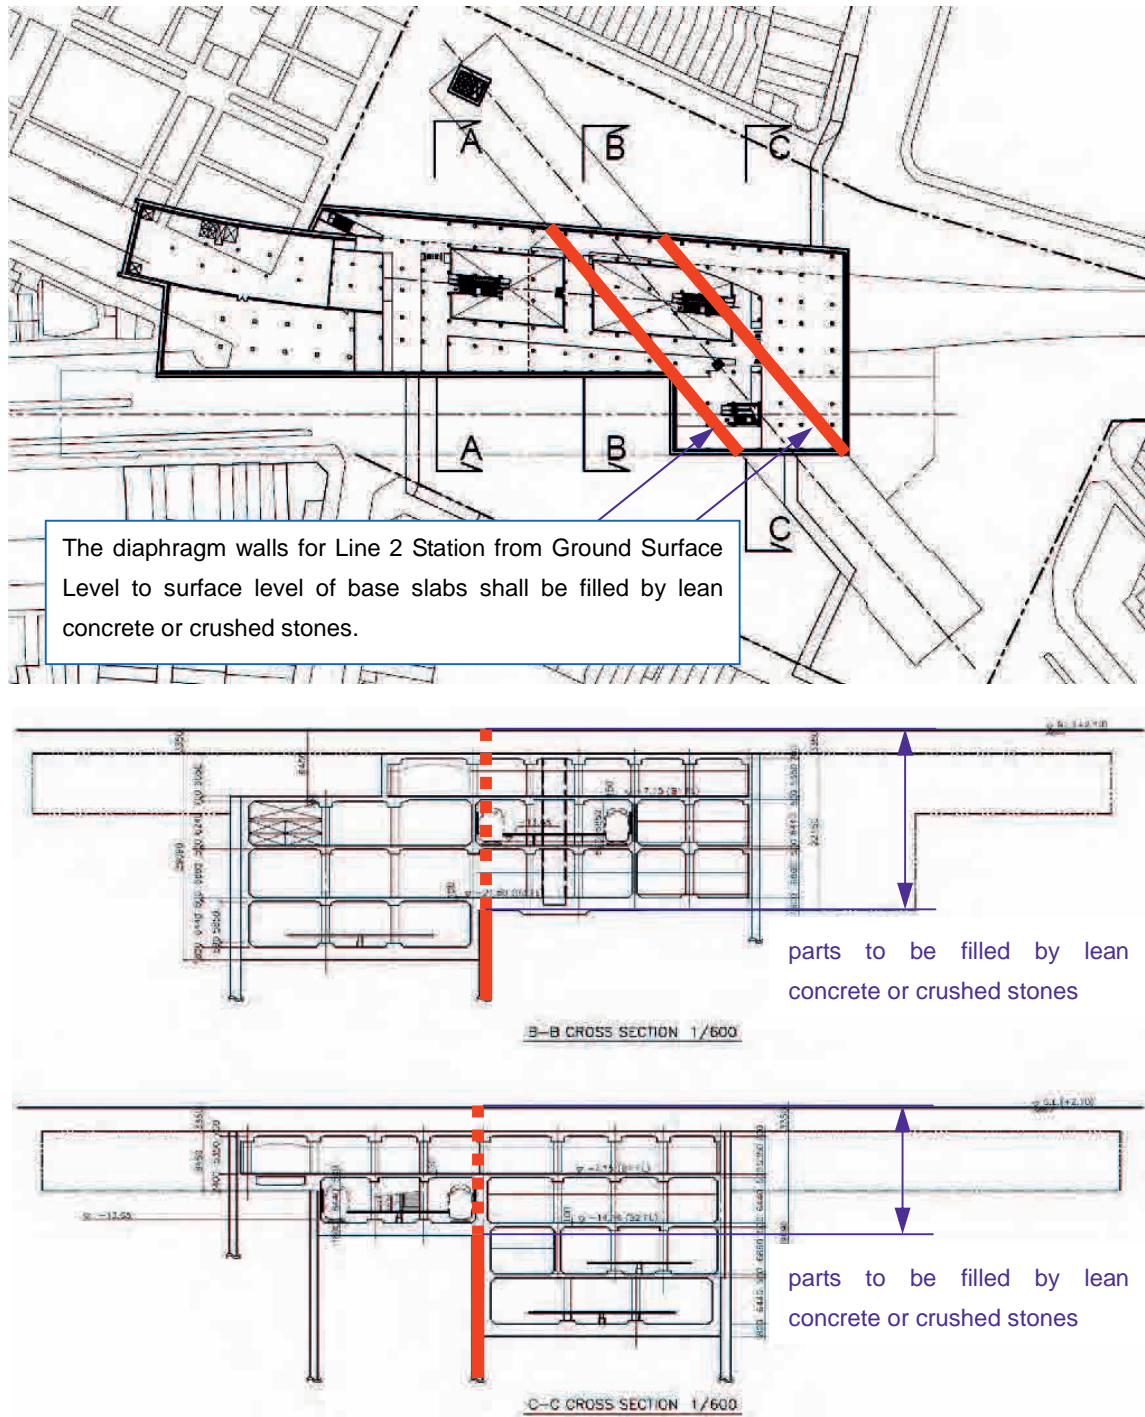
Arrangement of Retaining Walls for Line 1 & Line 2 Stations, Phase 1 of Option 2
